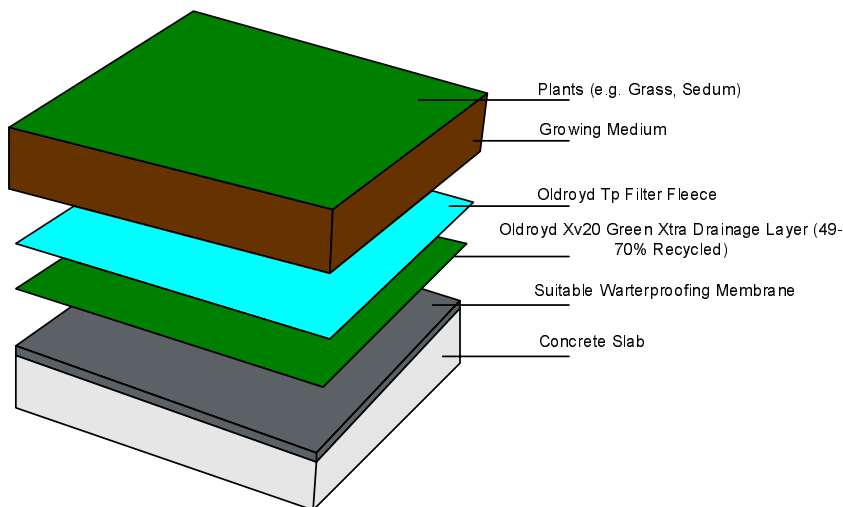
Typical layer build-up of flat green roofs⁴⁴
